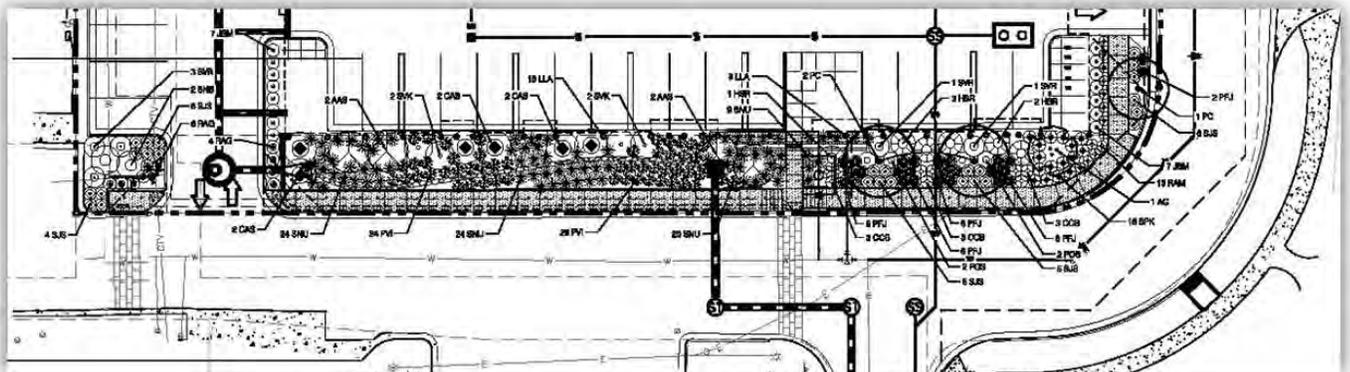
Revised south landscape setback with a walkway proposed to cantilever over the detention
